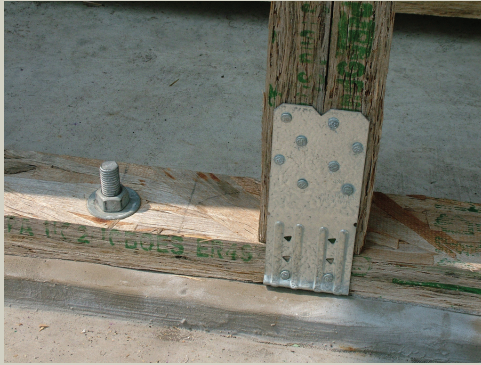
In some retrofit examples, it is possible to tie a portion of the house to the foundation. Here, a metal strap connects the vertical post to the foundation, which finishes the continuous load path connection from roof to the foundation. Source: Louisiana Sea Grant.
